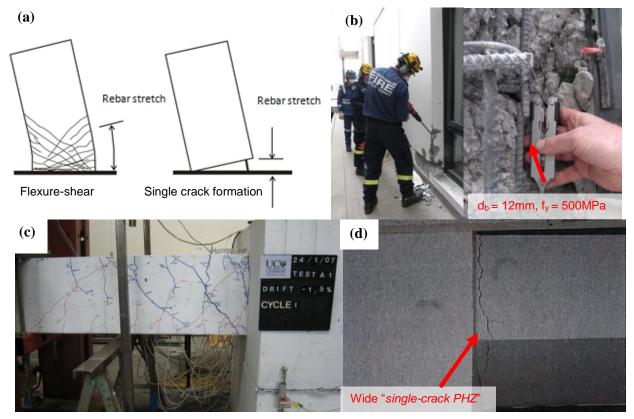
(a) Crack patterns in deflected walls; (b) 11 storey wall building in Christchurch CBD with USAR team removing cover concrete of fractured longitudinal reinforcement (Bull, 2012). (c) Distributed cracks observed in experimental testing (Walker, 2007); (d) inelastic deformations concentrated at the column face of RC frame buildings in Christchurch CBD (Smith and Devine, 2012a).
